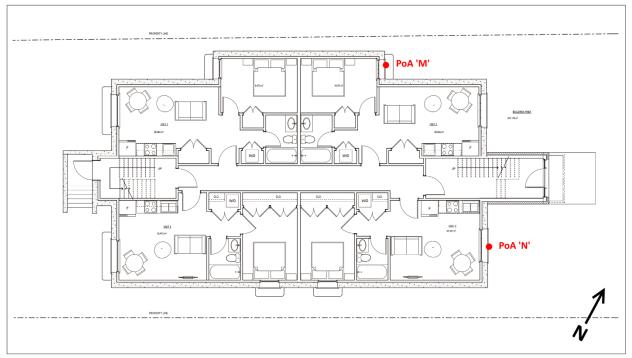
Site plan showing location of Point of Reception POA 'M' and 'N' on the Lower Level of Building 'B'.
